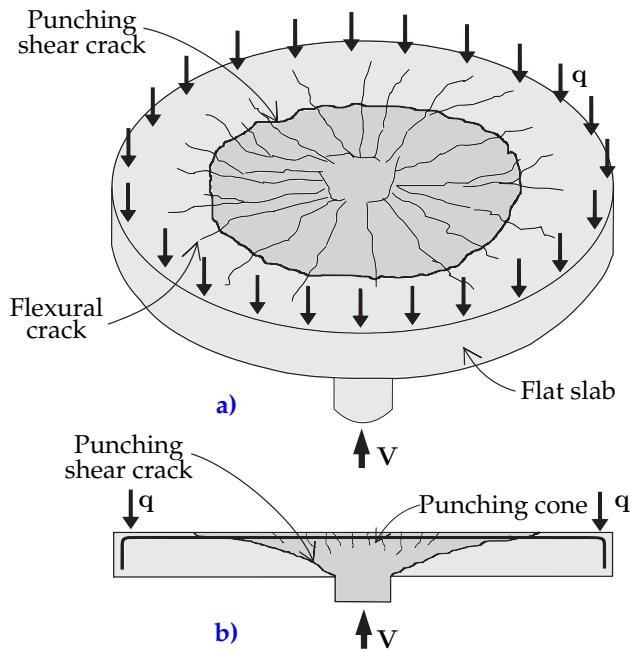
Isolated interior flat slab-column connection region and typical punching shear failure surface, adapted from [Bompa and Onet \(2015\)](#): a) Isometric view; b) Section view.
